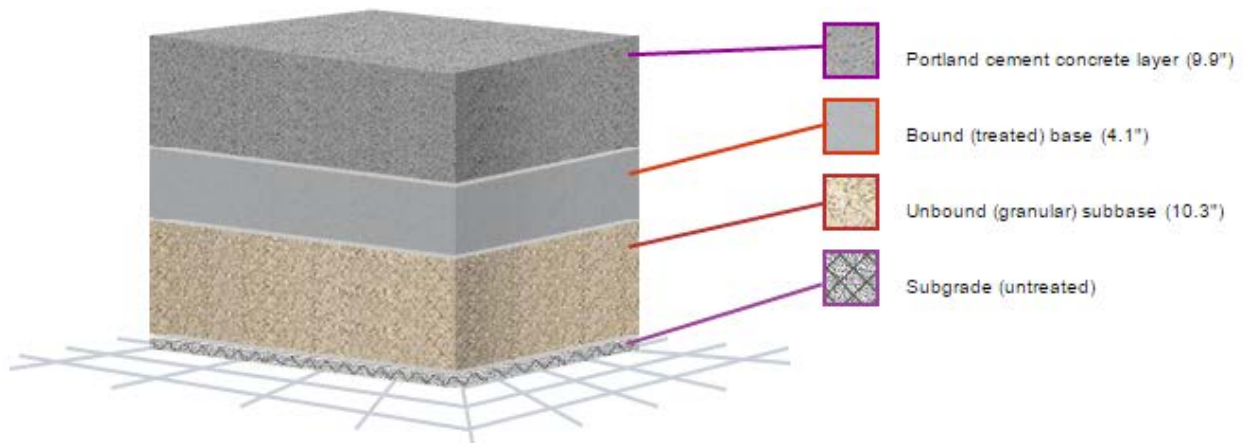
Pavement structure of LTPP Segment 40-4166
